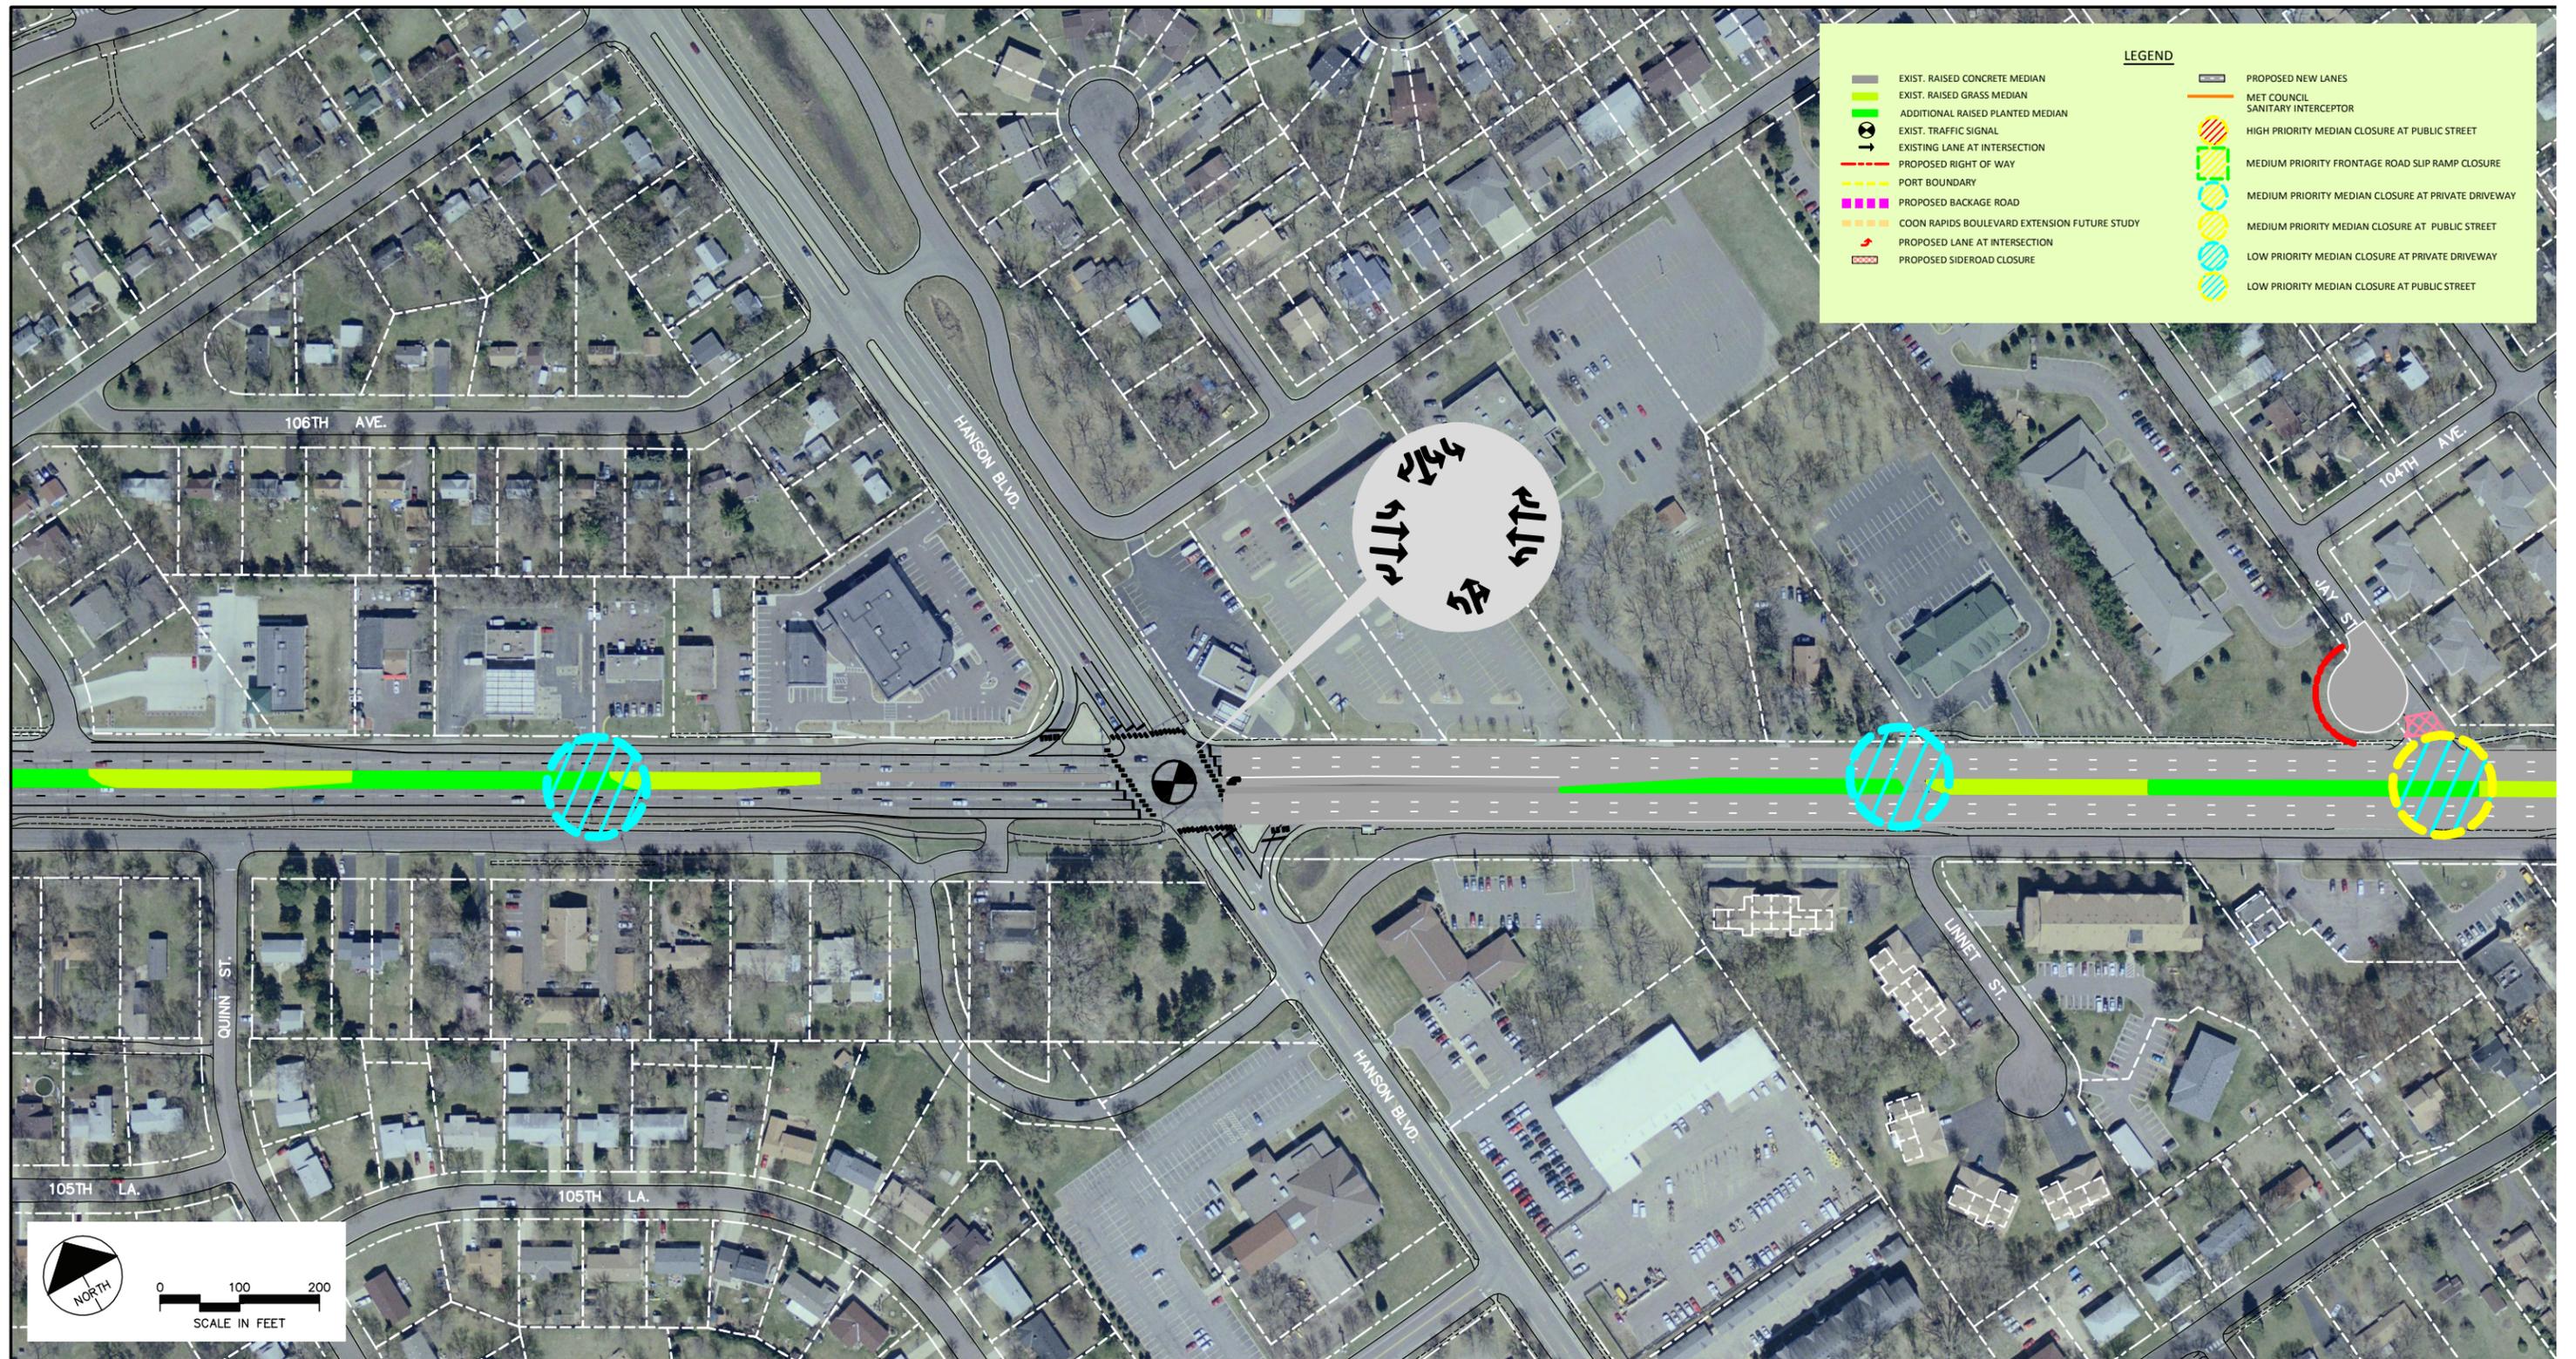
Proposed Roadway Recommendations Detail (8 of 15)
